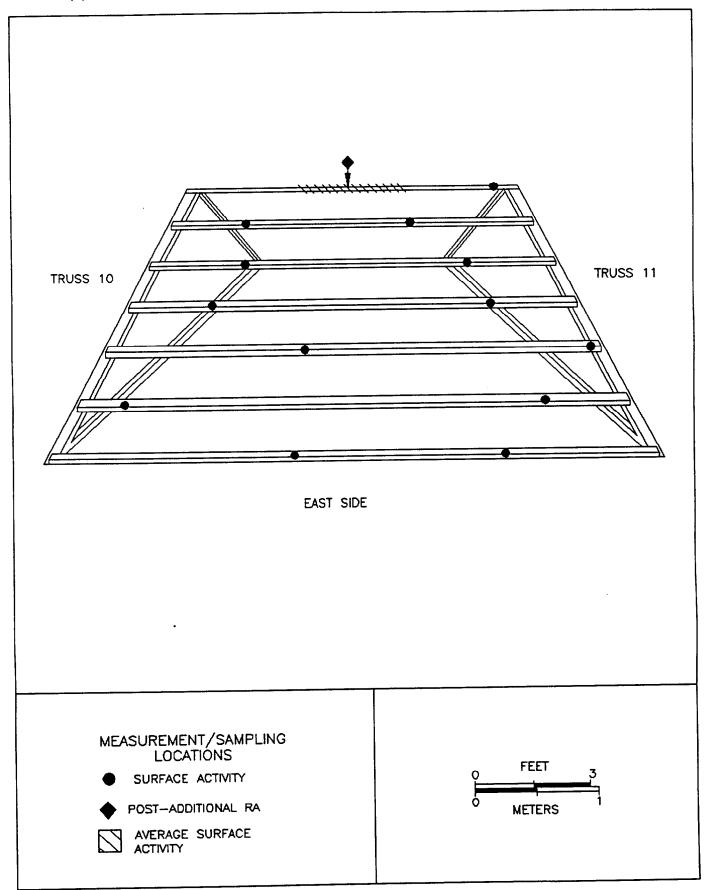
Building 3, Bay 10, East — Measurement and Sampling Locations
